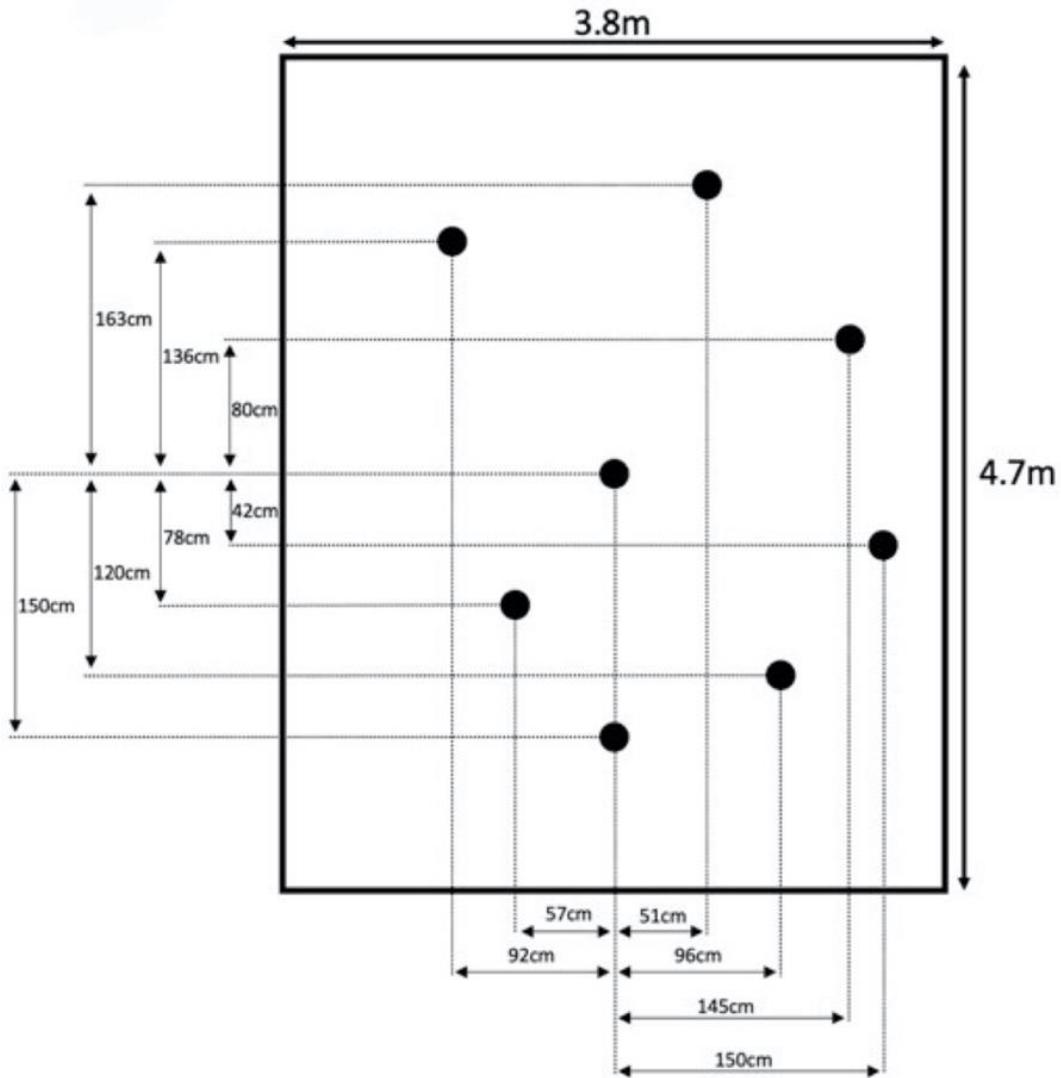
Coordinates of the eight accelerometers on the ceiling of the floor specimen.
